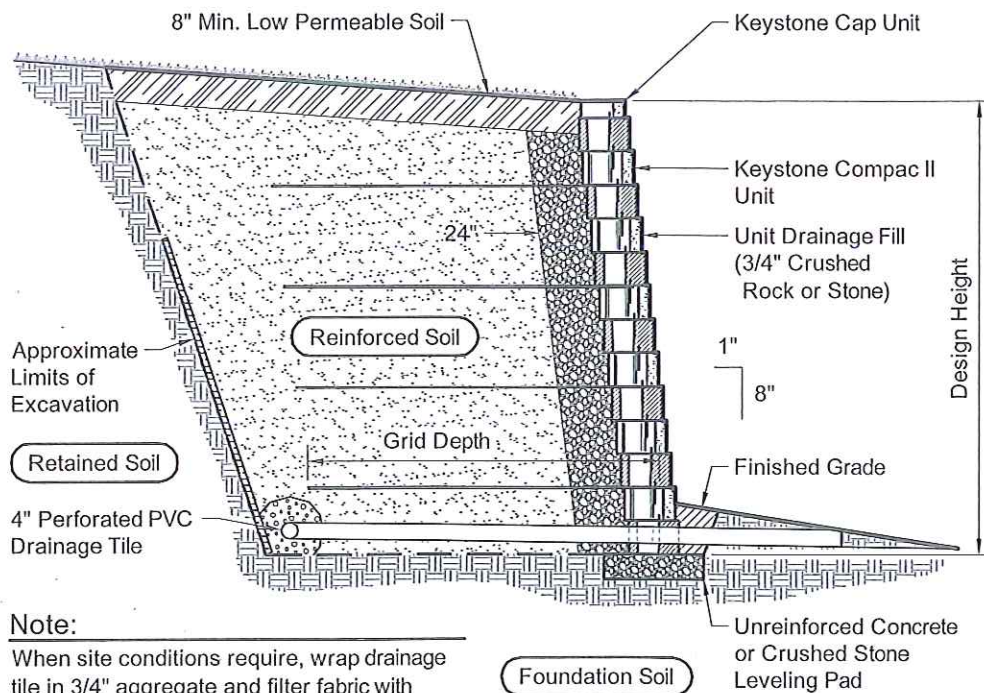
(REINFORCED WALL) NEAR VERTICAL SETBACK
